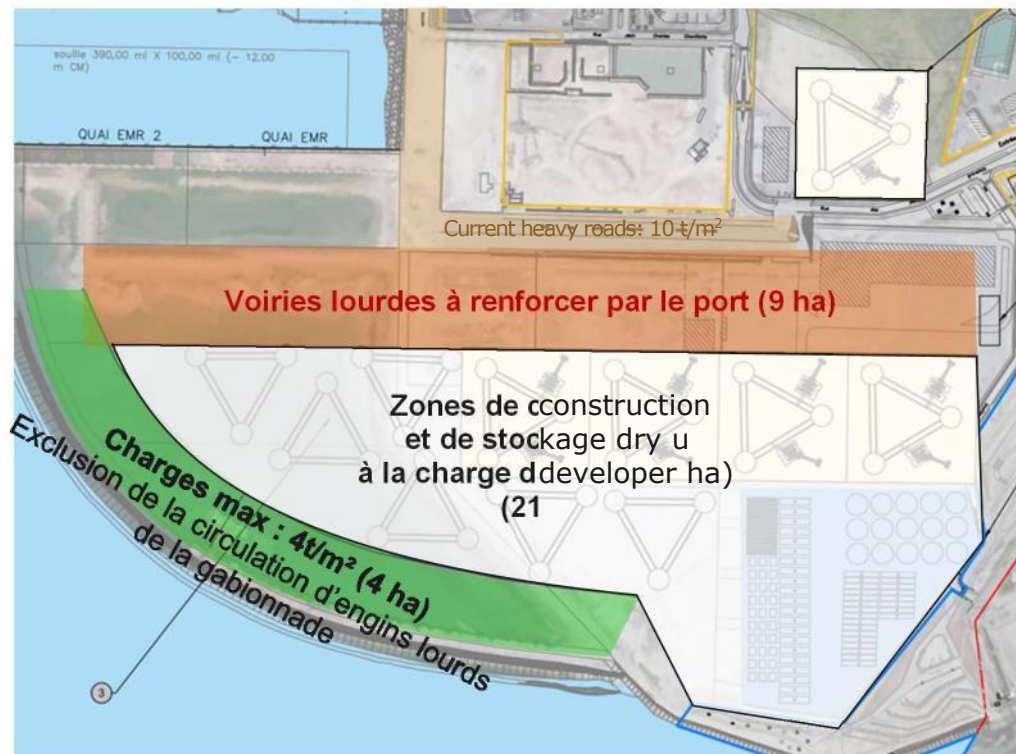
Zoning of reinforcement work to be carried out on the old and new polders
